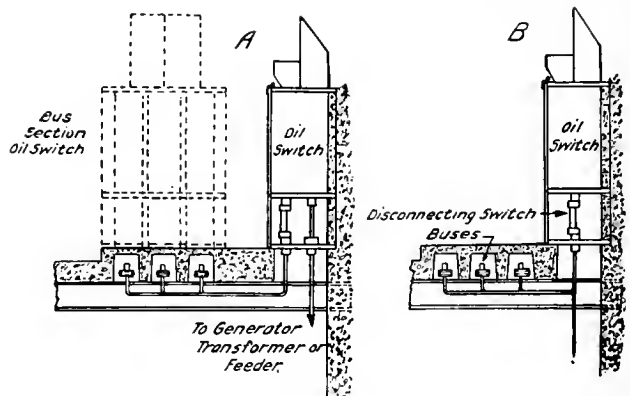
Two Arrangements for Oil Switches with Disconnecting Switch Sub-Compartments and with Buses in the Floor
